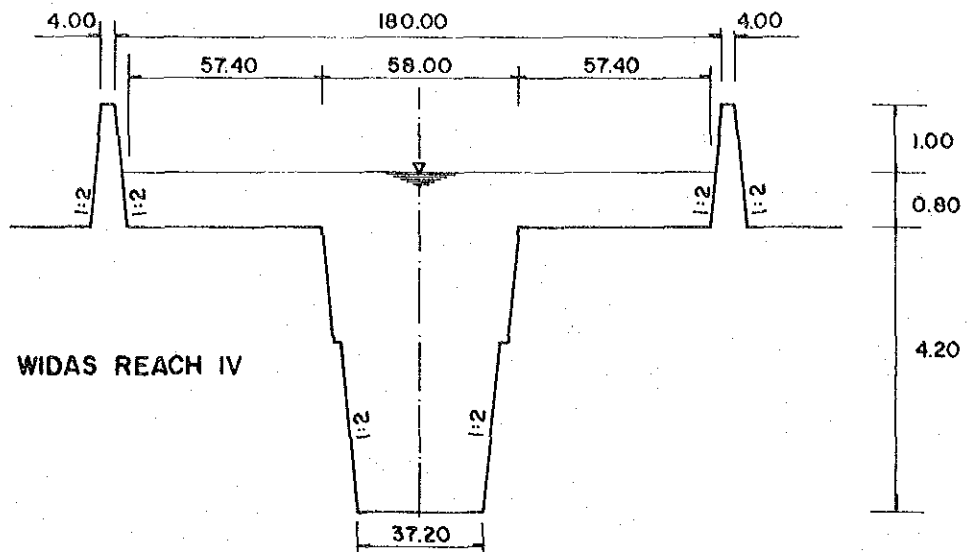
TYPICAL RIVER CROSS - SECTIONS FOR FIRST STAGE PLAN (2/6)
